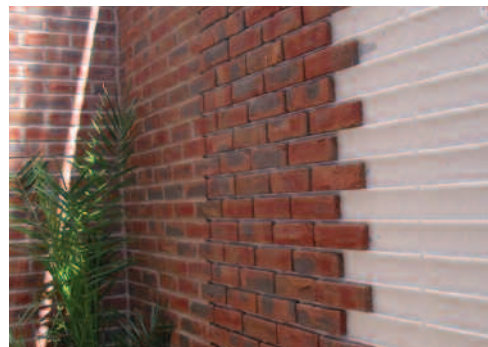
Modern cladding systems can be much lighter than a 100 mm brick outer leaf.
